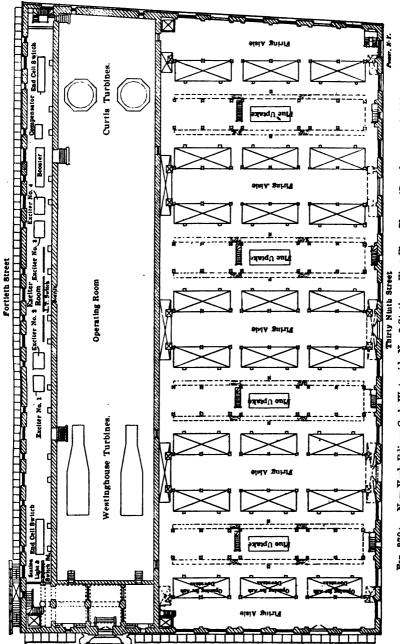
New York Edison Co.'s Waterside No. 2 Station: First Floor Plan. (See also pp. 444, 455, 481.)
